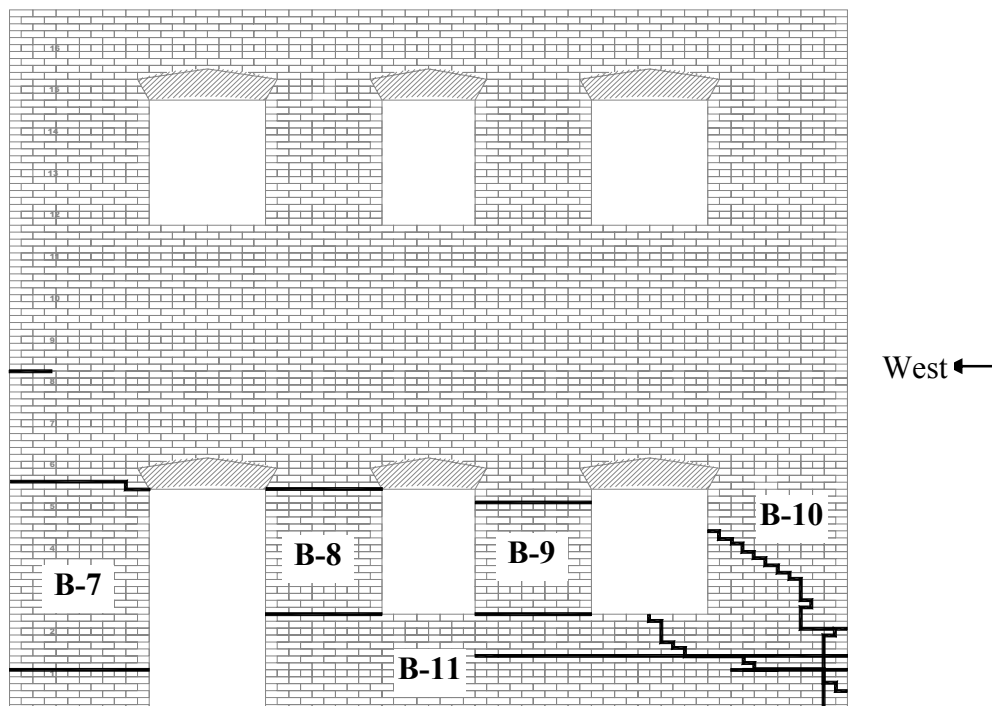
Existing cracks in Wall B before test (looking north)
